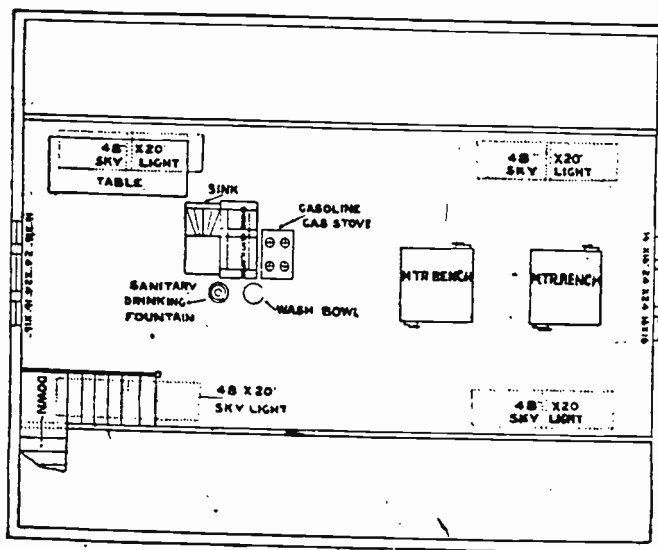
Attic plan, model rural school, Kirksville, Mo.
